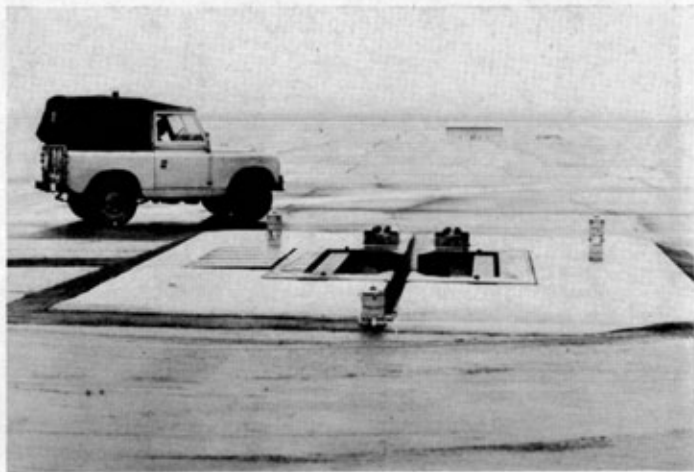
Bare retractable runway edge sheave foundations at RAF MANSTON with the EAU foundations in the background (this RHAG is mounted on a disused paved area).
